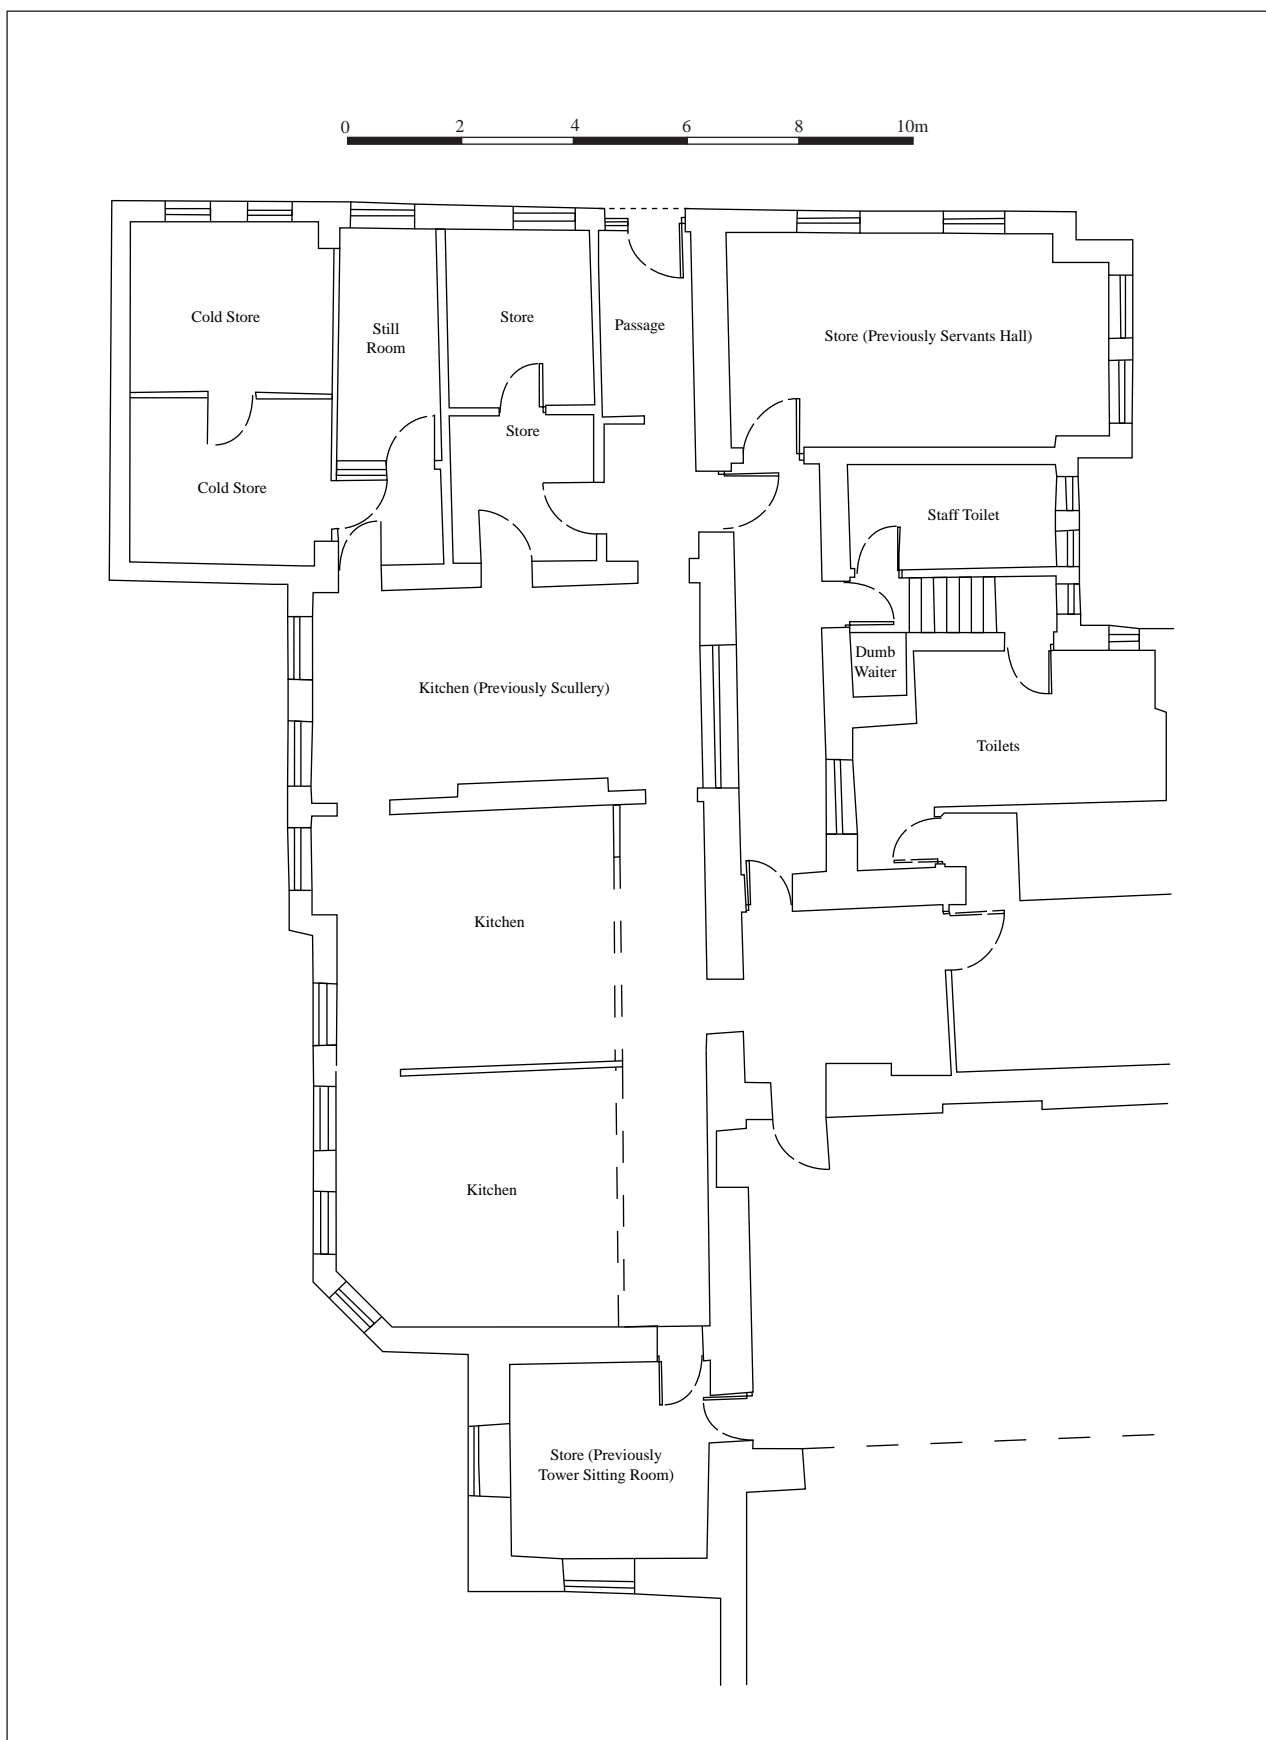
Ground Floor Plan of 1919 Extension, Deganwy Castle Hotel
